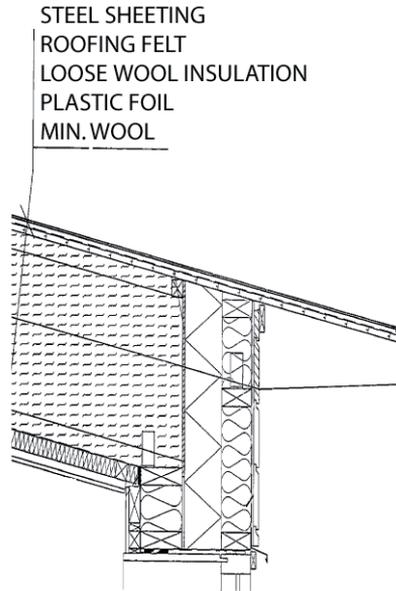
Roof construction (Drawing: Vårgårdahus).
